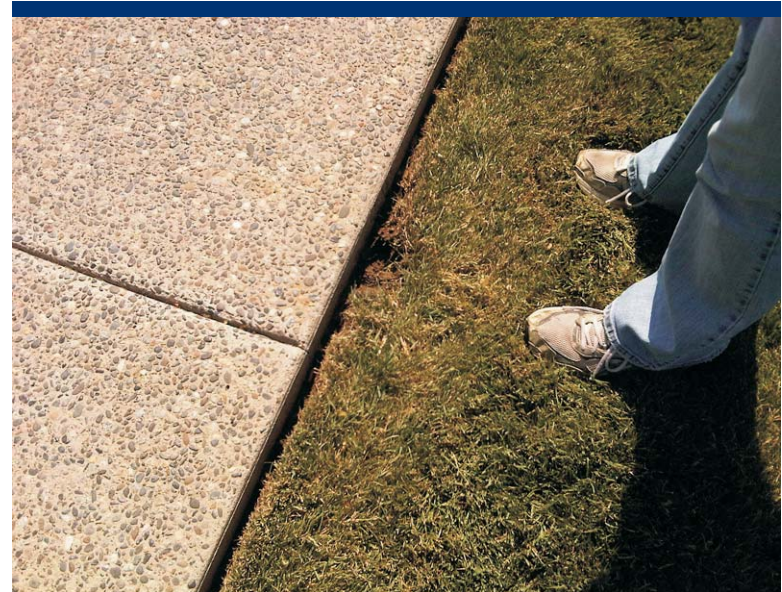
Area of visible mercury beads interstitial space between the sidewalk and the lawn.
